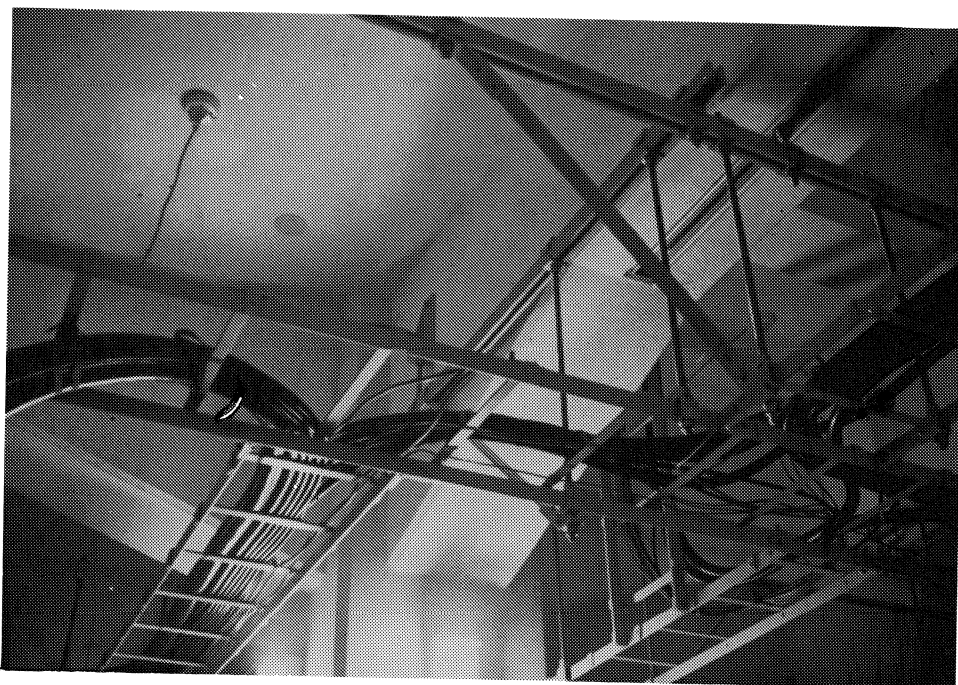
Okushiri-cho remote control switch building; the telecommunications equipment in the building was well-braced in both directions, to floor and ceiling. No damage was observed or reported.
